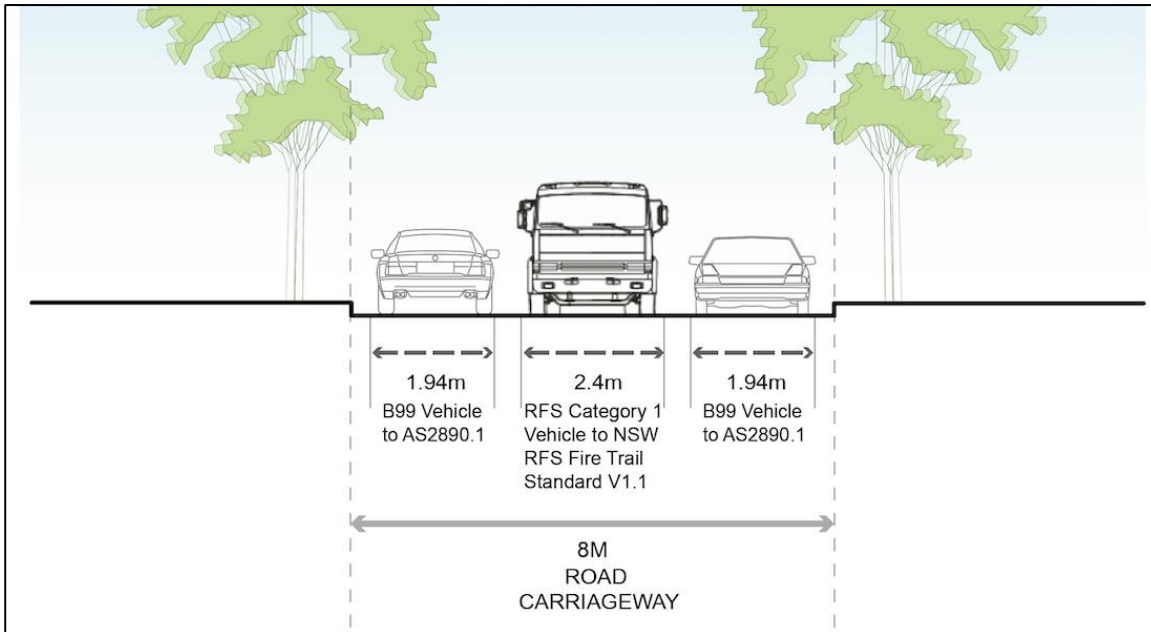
Typical 8m wide perimeter road carriageway with vehicles shown for context
